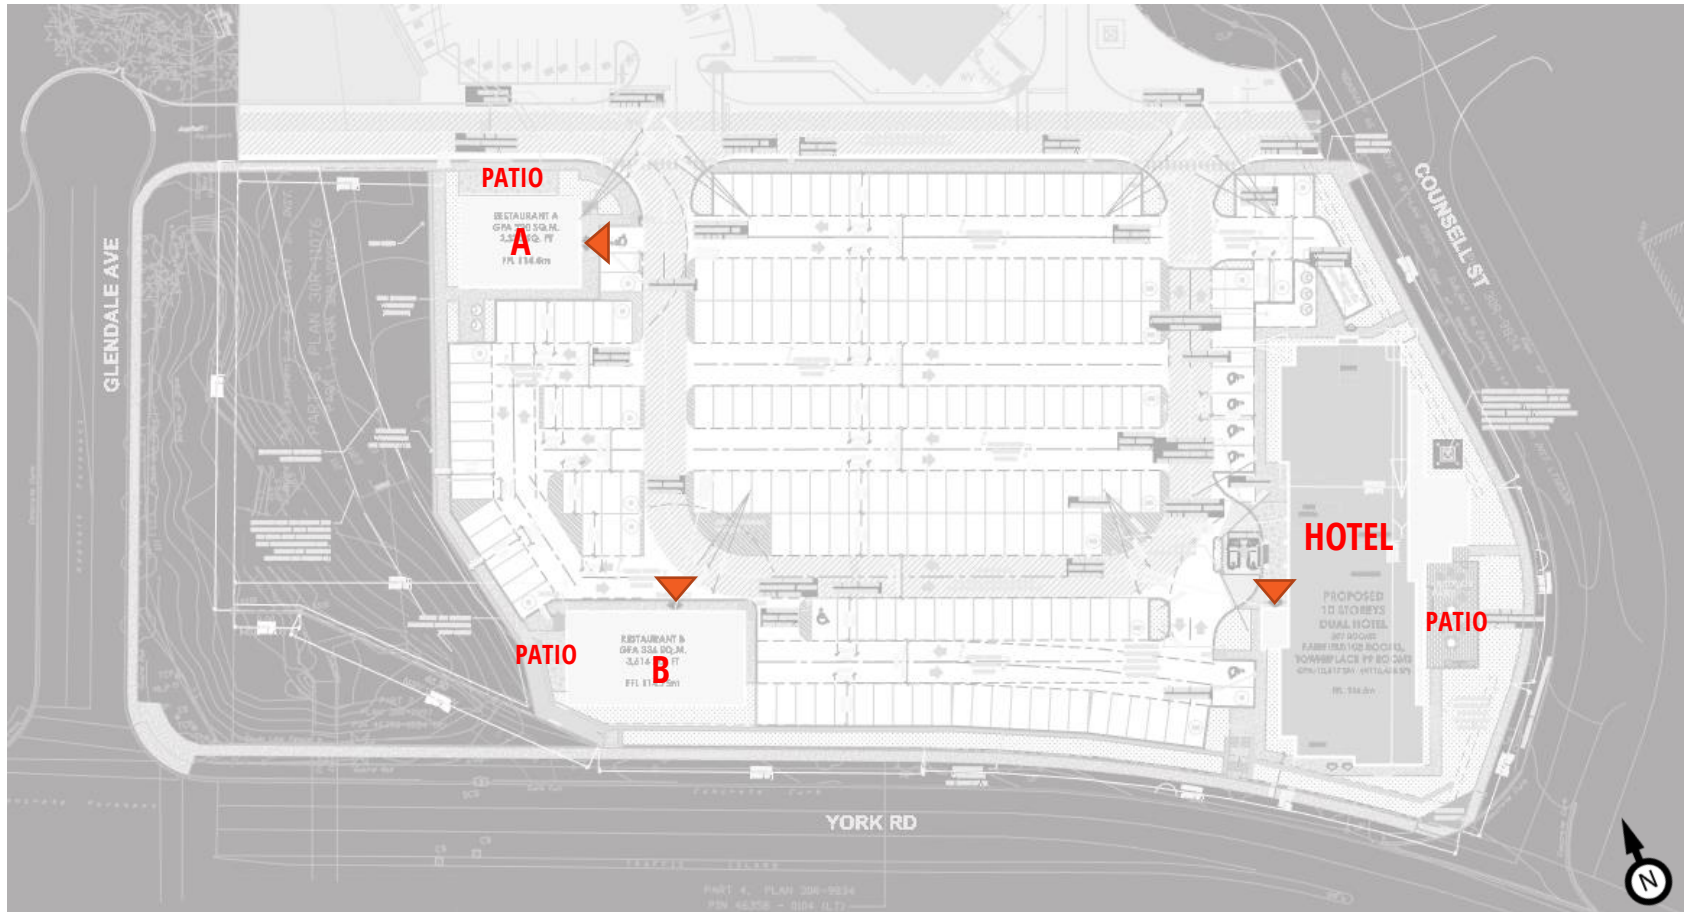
Site Plan of the Proposed Hotel and Restaurants A and B
